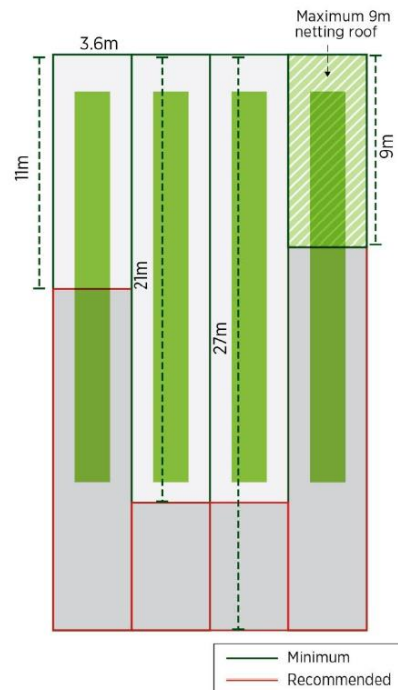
Cricket Net Practice layout (dlgsc.wa.gov.au)
